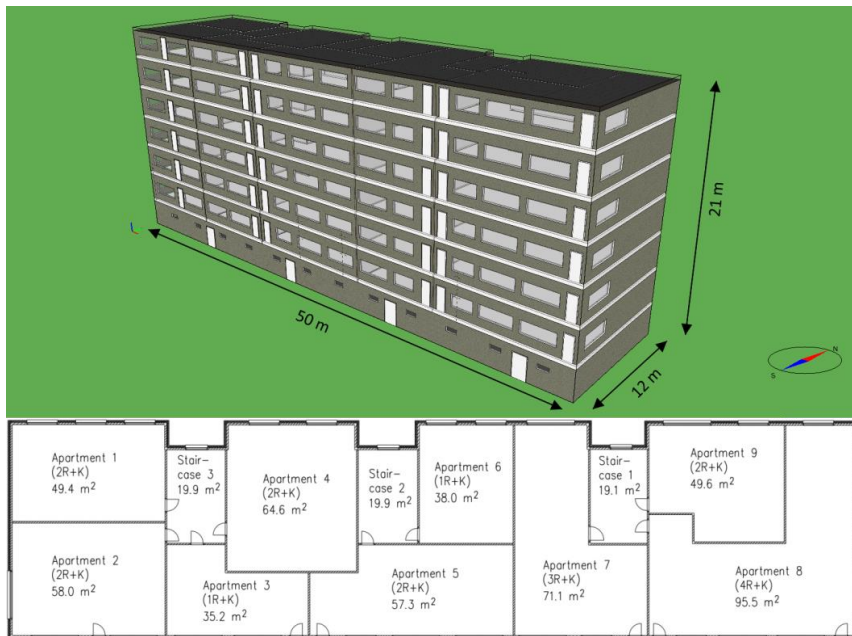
The main geometry of the studied brick apartment building (above) and the floor layout of the apartment floors (below), r = room, k = kitchen.
